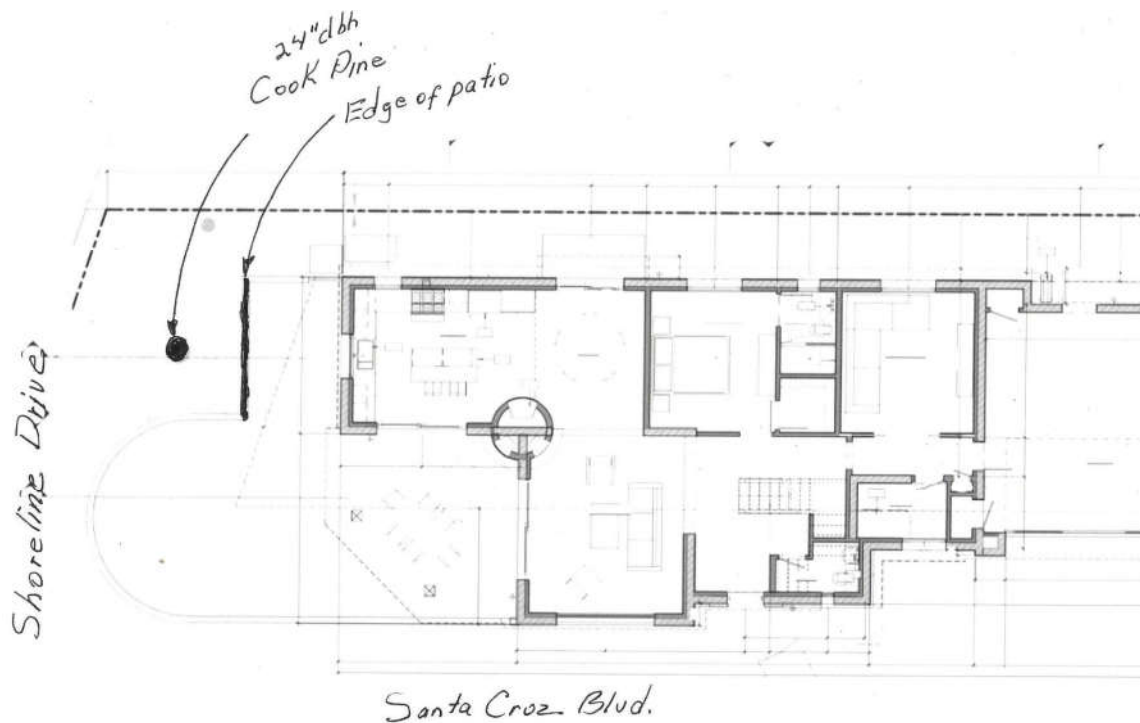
A partial scan of the site plan shows the location of the Cook Pine in relation to edge of the patio.
